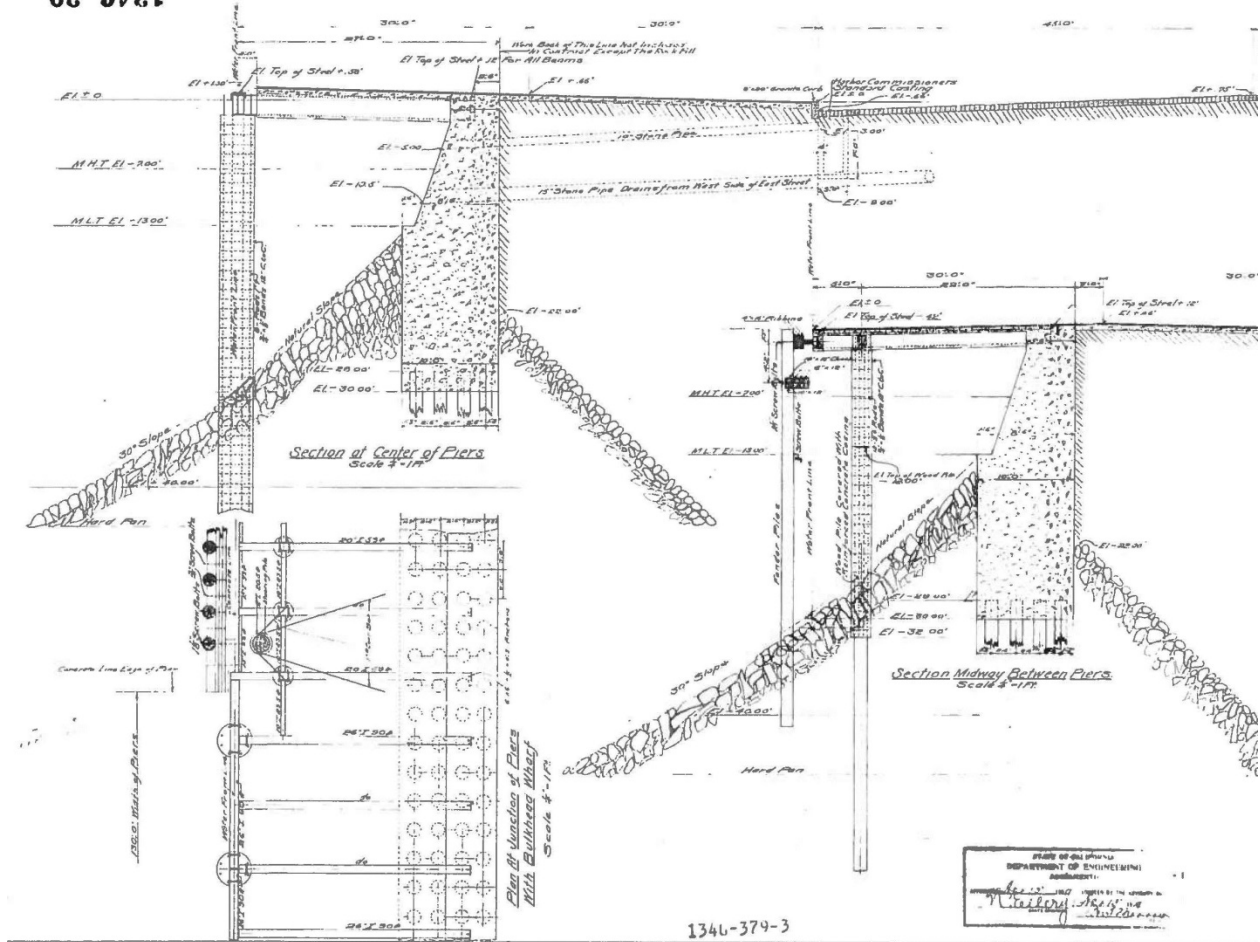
Section 9 Bulkhead Wharf Between Piers 26 & 28 –Section View (Port Drawing 1346-379-3)
